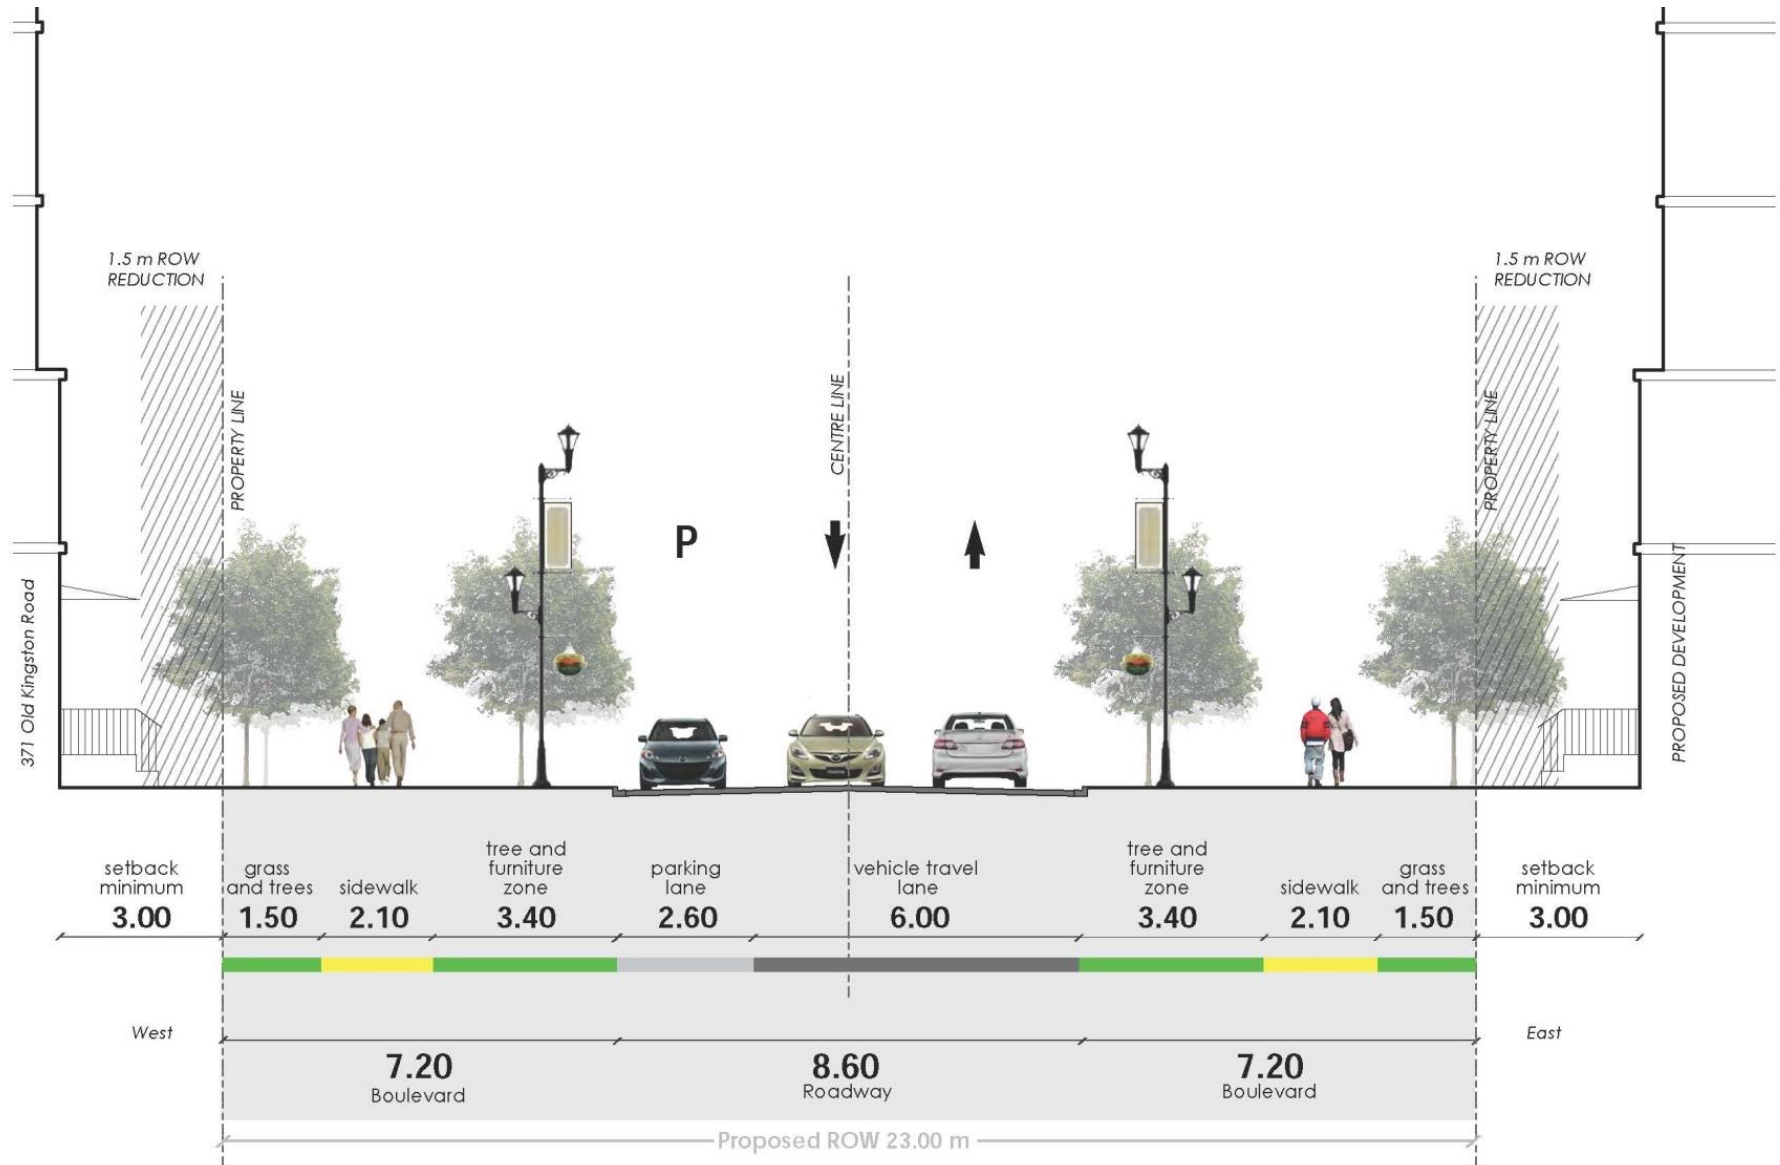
Typical Sections for Schedule A+ Project: Realignment of Kingston Road and Morrish Road (Morrish Road South of Old Kingston Road)
